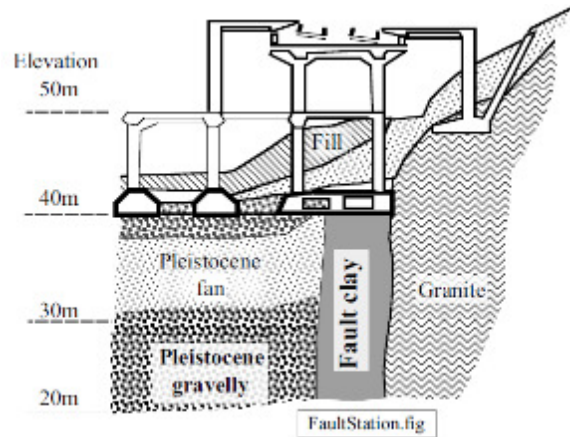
Separated structure of New Kobe railway station resting on reverse fault
